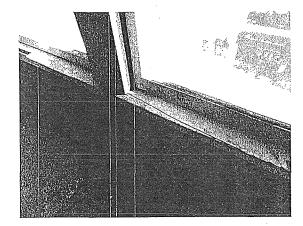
Detail photograph of split window sill (photograph taken on 02/27/2018)
